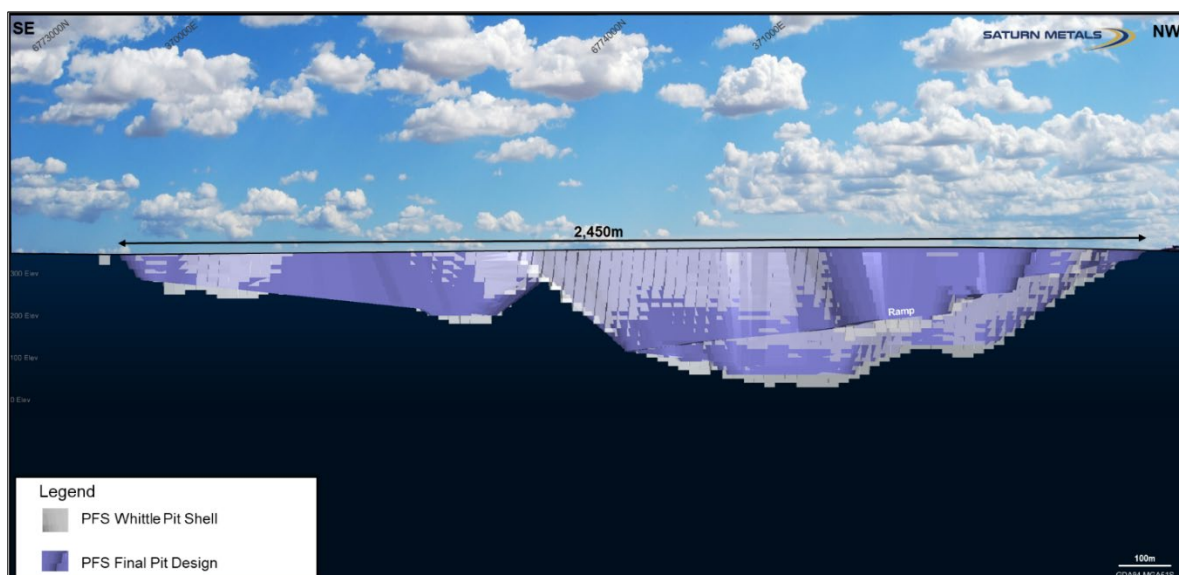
Long-section view of Apollo Hill PFS Whittle™ Pit Shell Compared to the PFS Final Pit Design.
